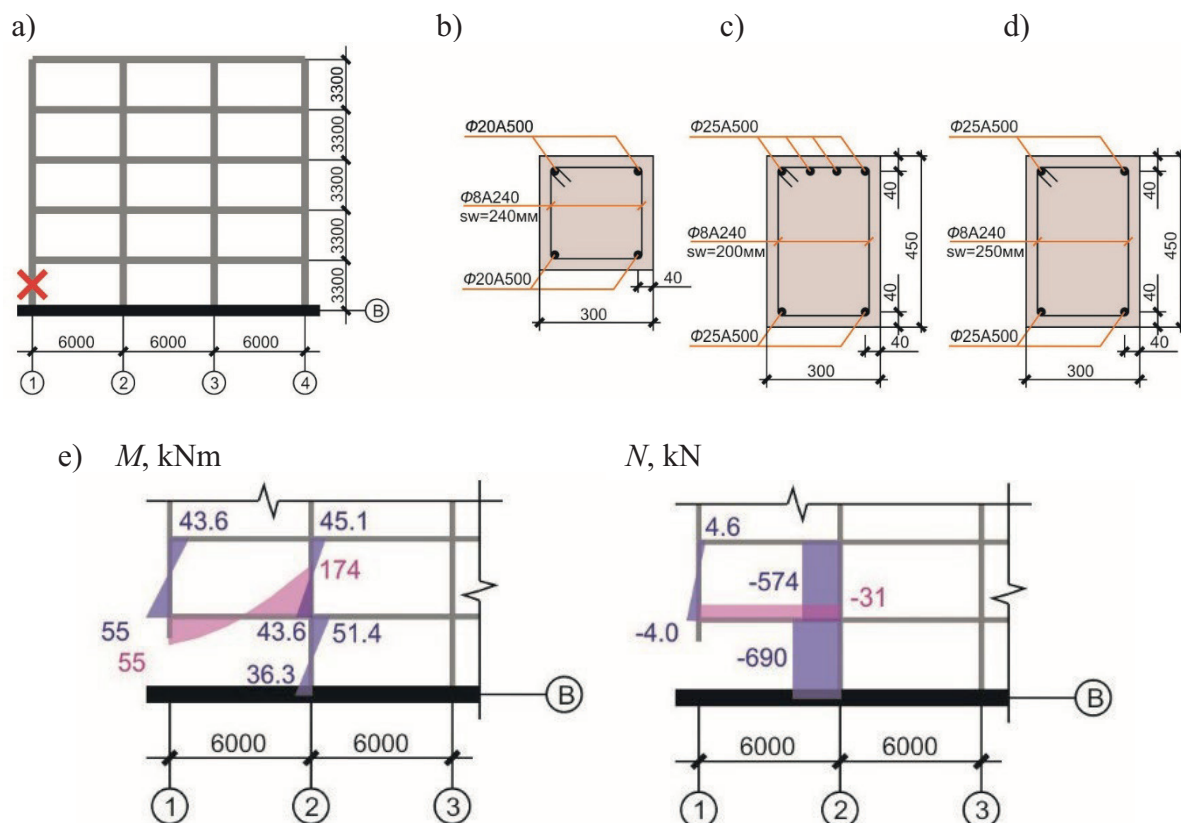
5-storey reinforced concrete frame: a) primary design scheme; b) cross-section and reinforcement scheme of the columns; c) the same for the supporting sections of the girders; d) the same for girders in the middle of the span, e) the results of a nonlinear dynamic analysis for elements adjacent to the area of initial local failure for the time $t = 0.18$ s after the impact
